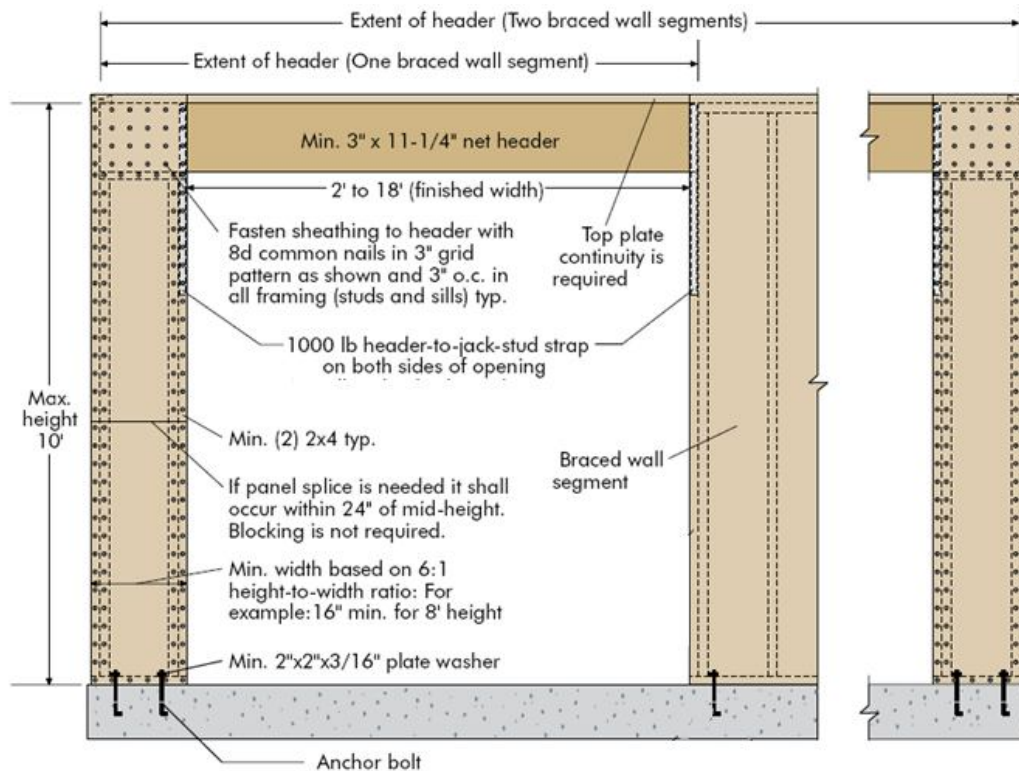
Construction details for the APA portal frame over concrete or masonry foundation [1.3]
